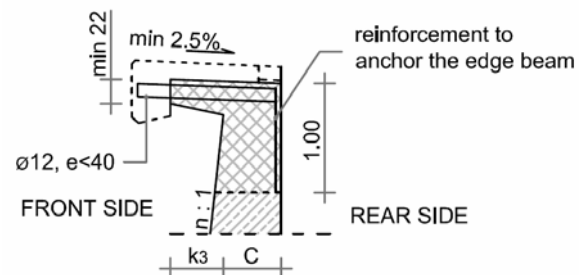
Detail of crown of concrete gravity supporting wall with a cantilever
